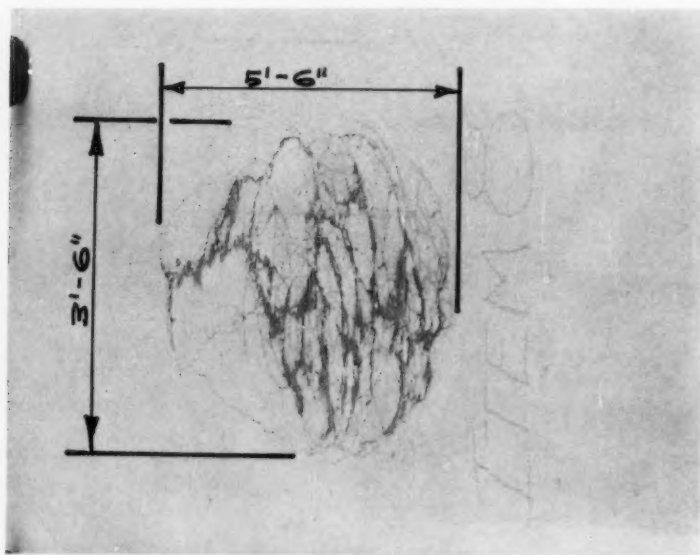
FAILURE OF FULL-SCALE 9-IN. THICK SLAB
